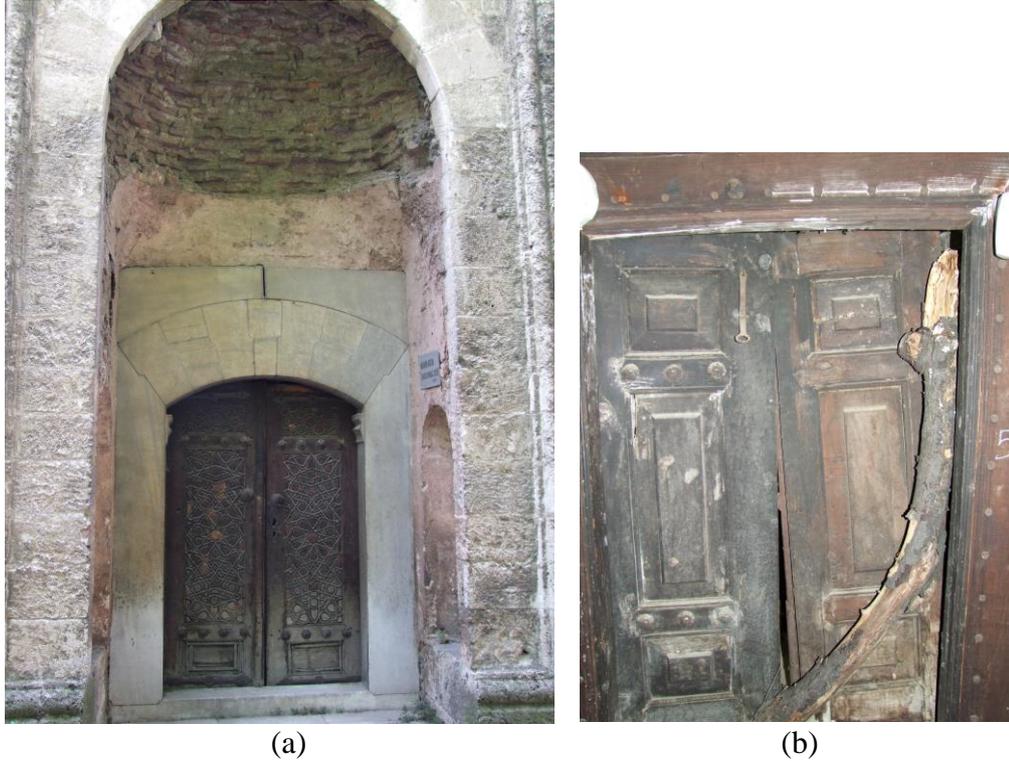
The photo showing the spalled plaster covering the stone courses and poor repointing.
